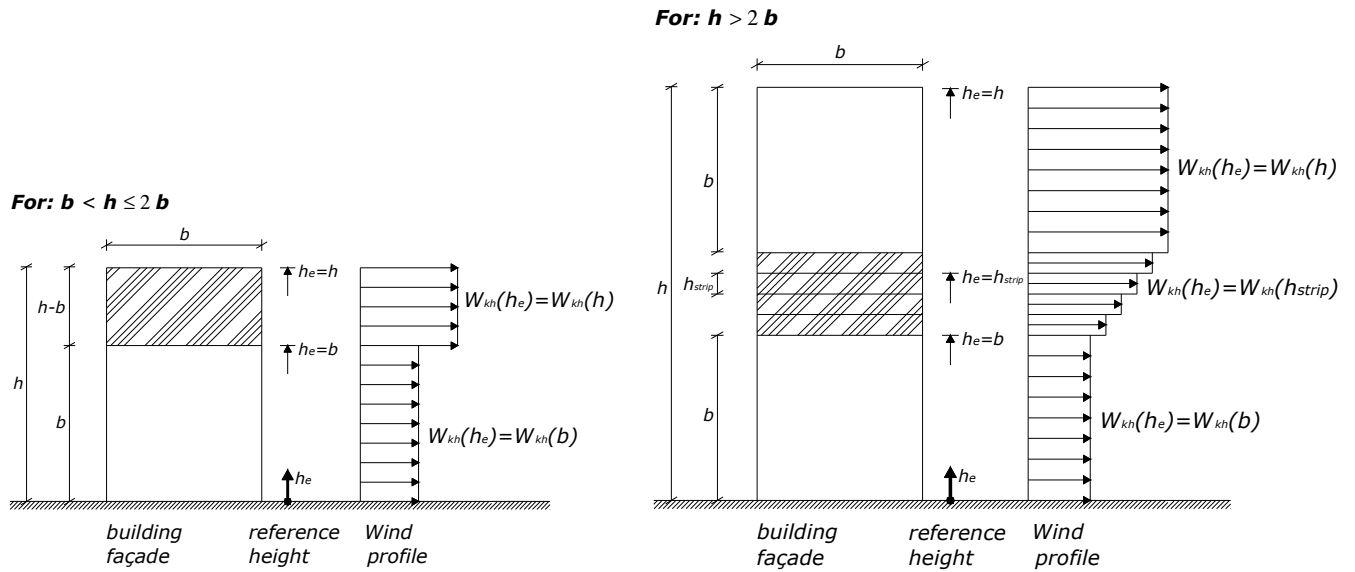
Reference height, h_e , and corresponding pressures profile for the windward walls of rectangular plan buildings
